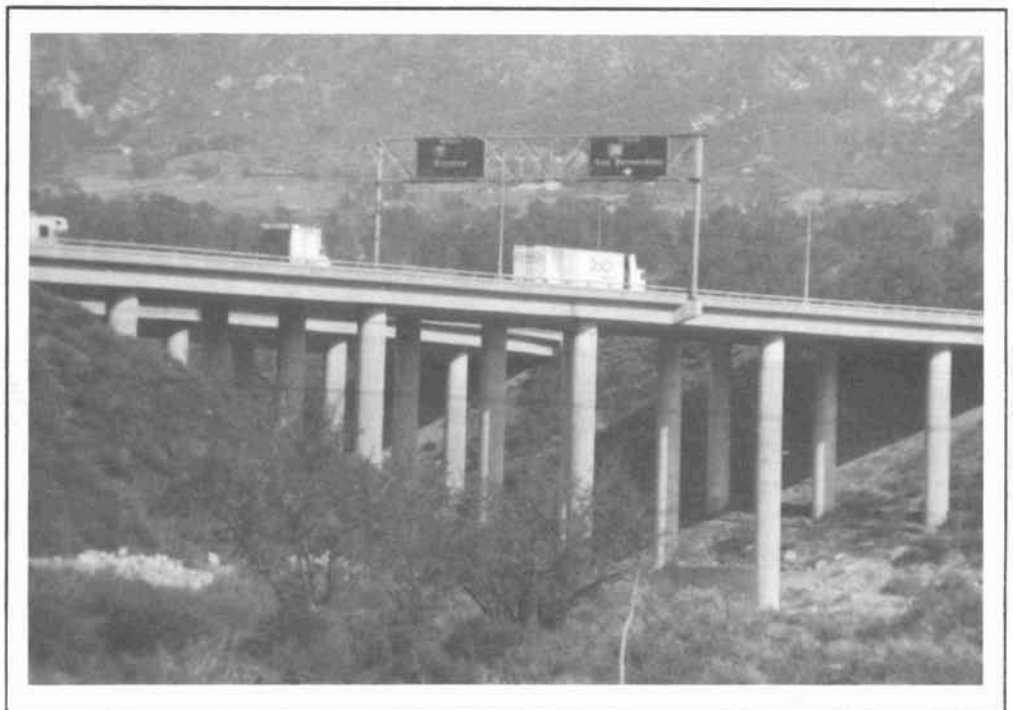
I-15 Bridge Over Cajon Creek Wash
